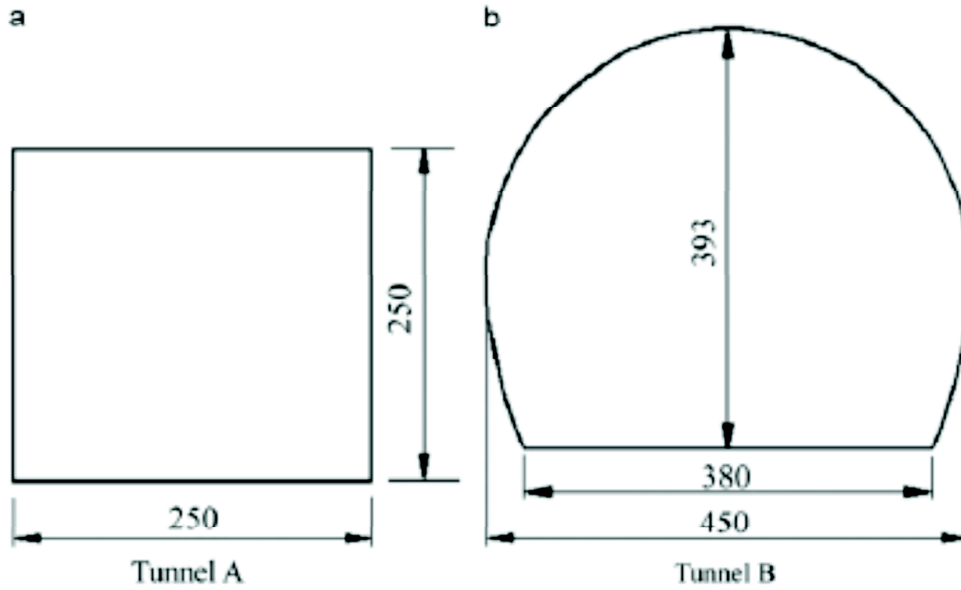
Cross-sections of Li et al. (Li and Ingason 2010) small-scale model tunnels (dimensions in mm).
